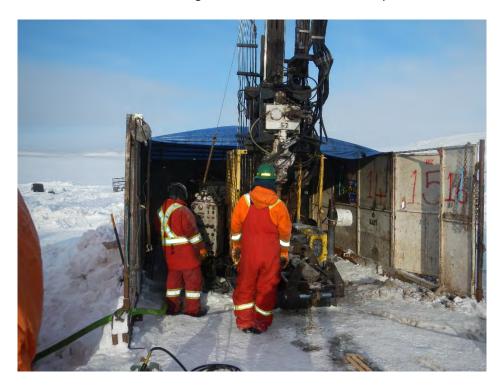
Drilling Conditions at BH18-BR15-1, April 2018
